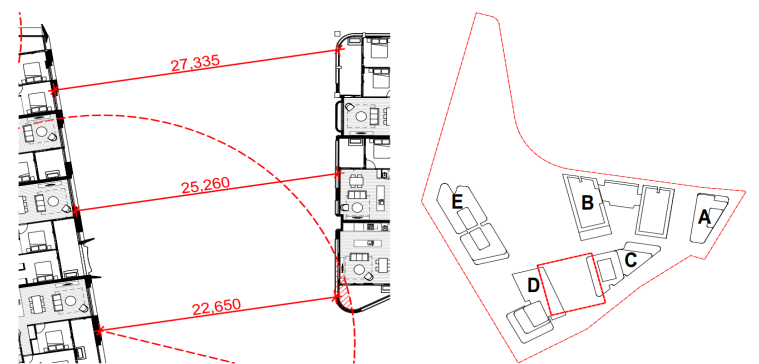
F1.4 Building D-C separation (storeys 1-9) & Key Plan
